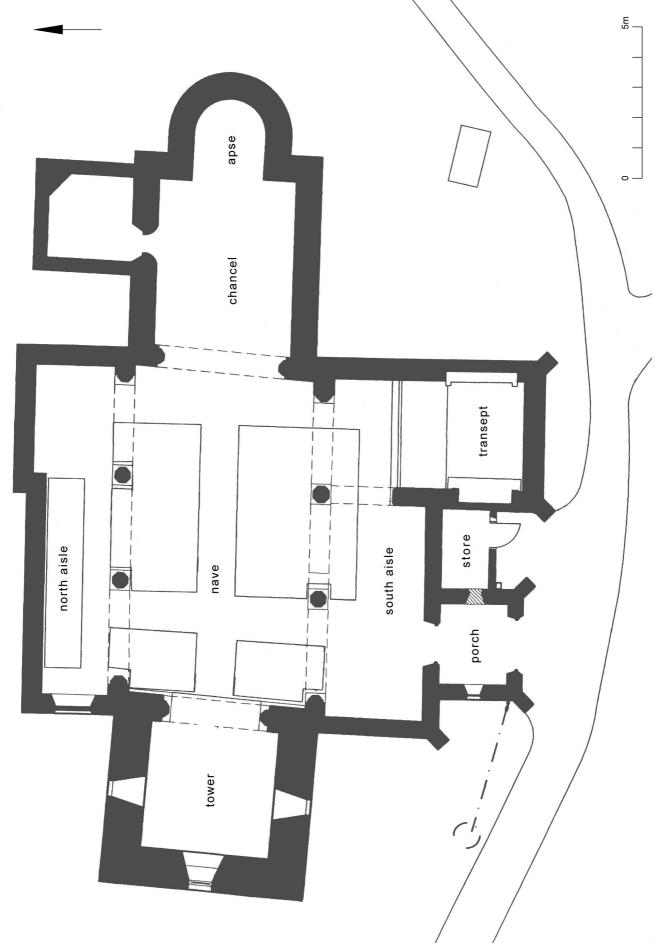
Floor plan of St Giles' Church prior to internal re-ordering (source: David Whymark Building Design and Conservation).
